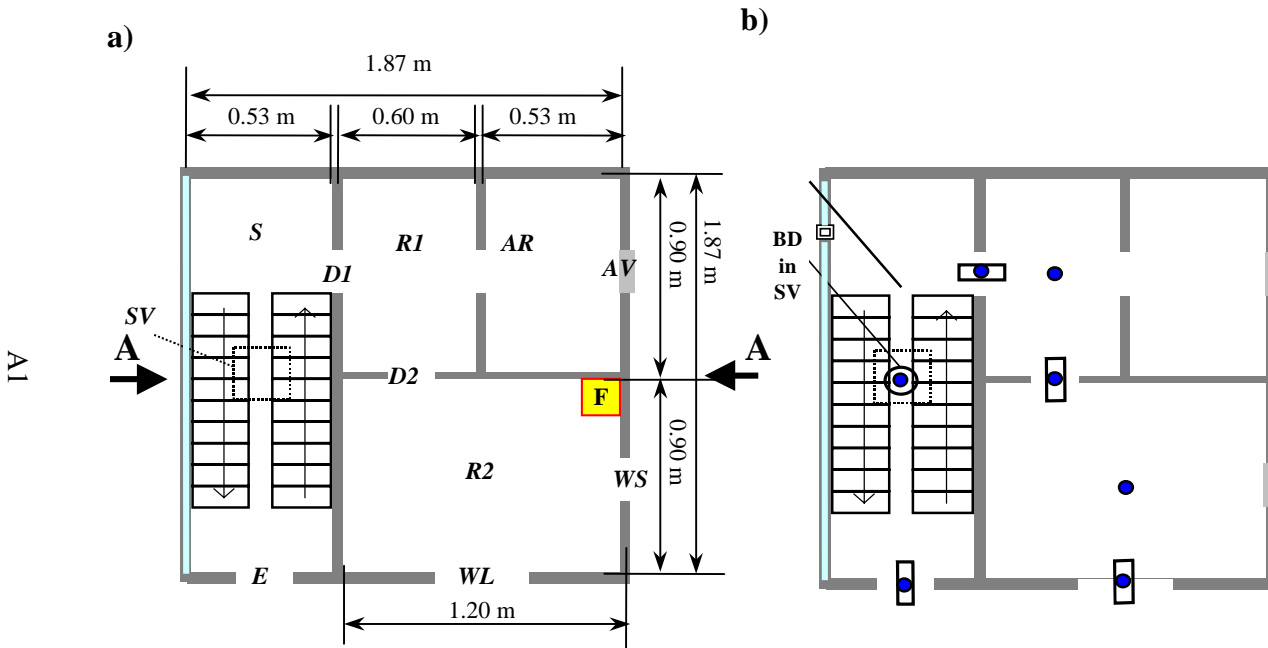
Layout of the model house (a) and the positions of the instruments (b). To enable visual inspection of the tests, the large wall of the staircase was made of an acrylic sheet. The dimensions of the rooms and openings are given in table A1. View along the cut A-A is shown in figure A2.
